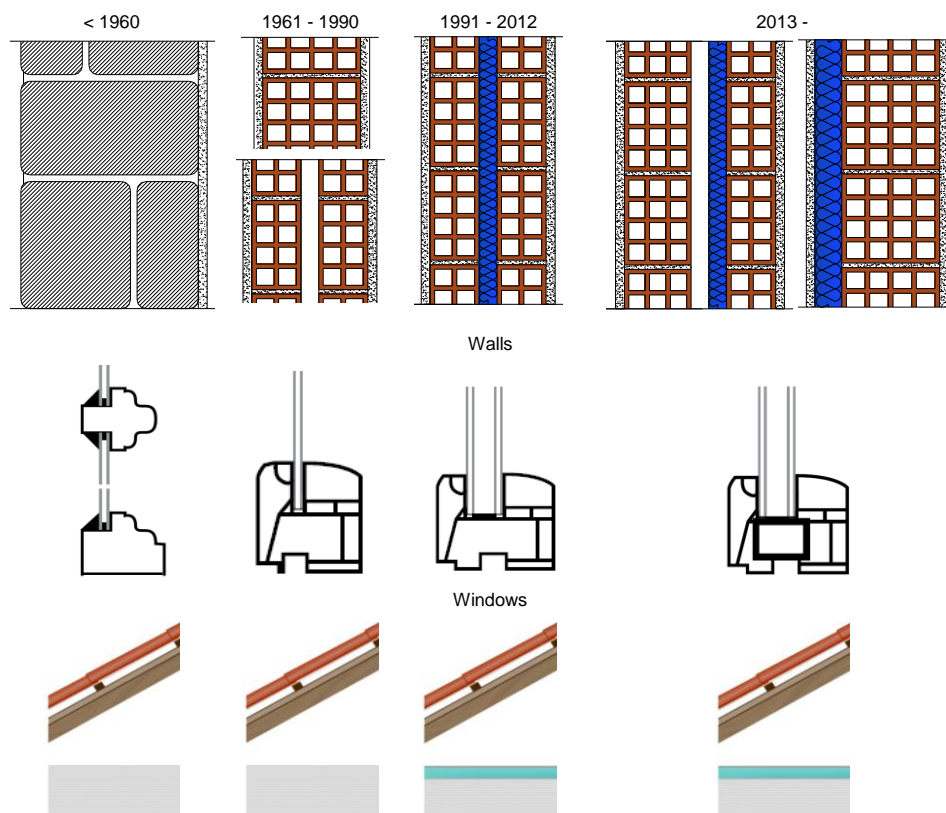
Conventional construction solutions for walls, windows and roofs for the single and multifamily Portuguese buildings
